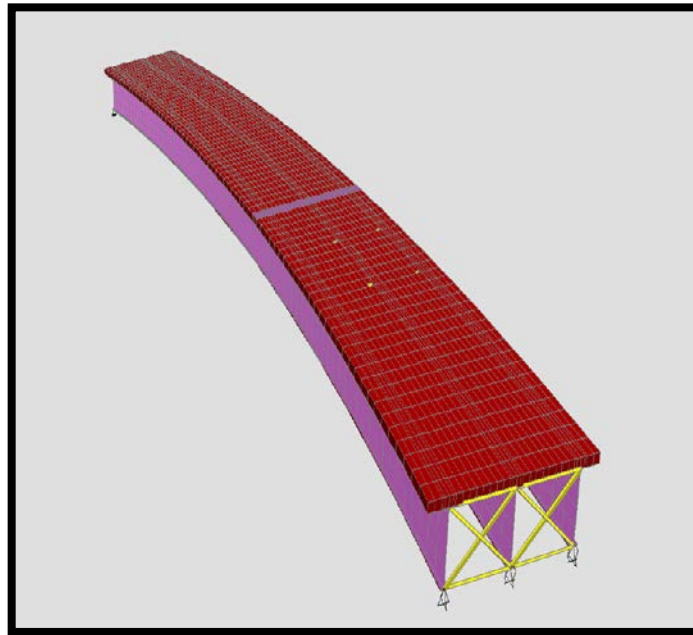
View from the SAP2000 Finite-Element Models for 3- Girder Curved Bridge.
